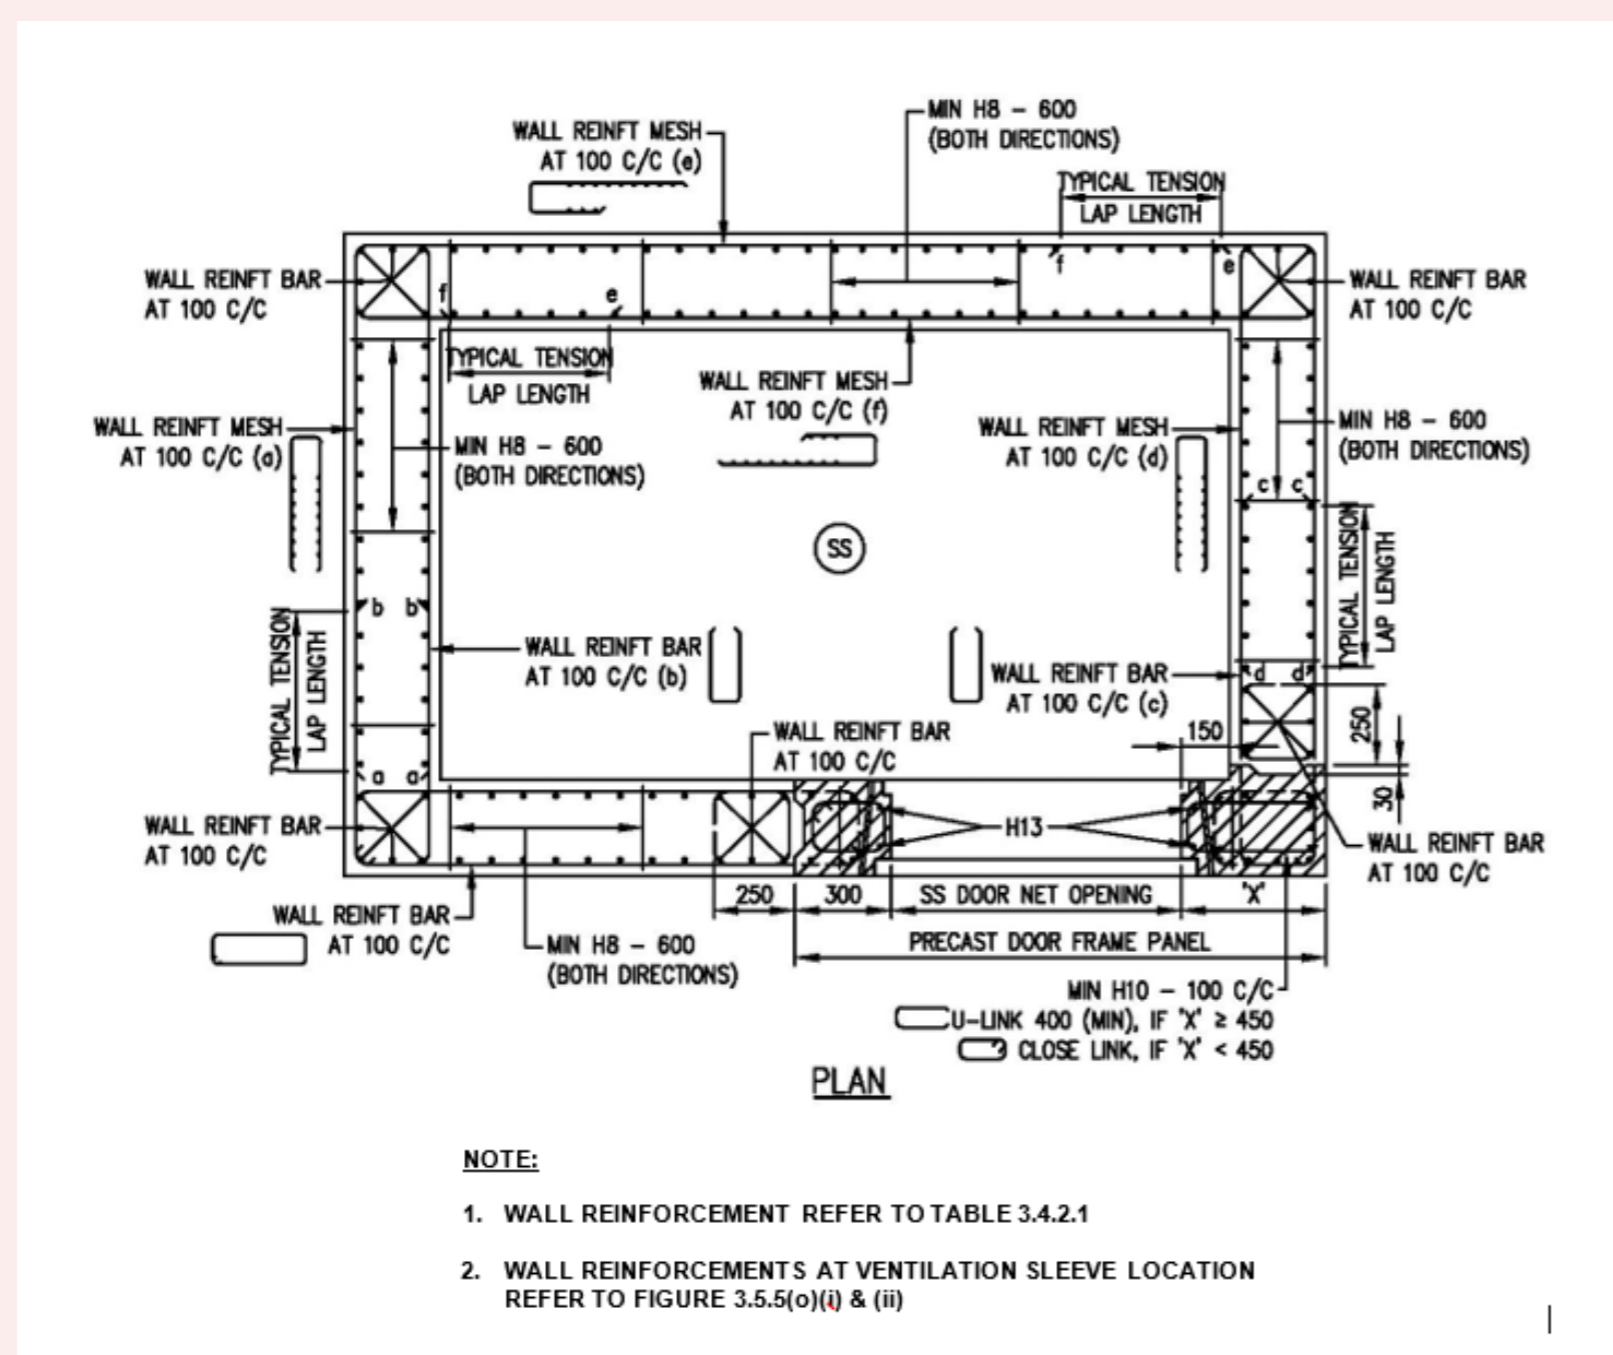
(g): PLAN OF SS WALLS WITH PRECAST SS DOOR FRAME PANEL (TYPE 2)
